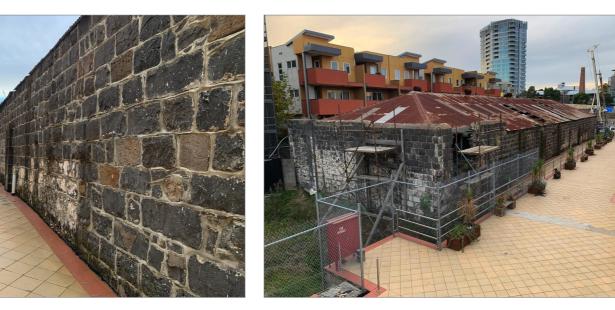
REAR SOUTH ELEVATION WITH COURTYARD
